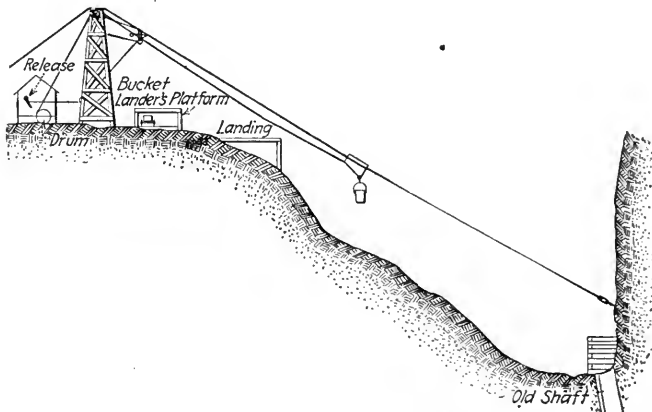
LAYOUT OF CABLEWAY, HEADFRAME, HOIST AND SHAFT.
